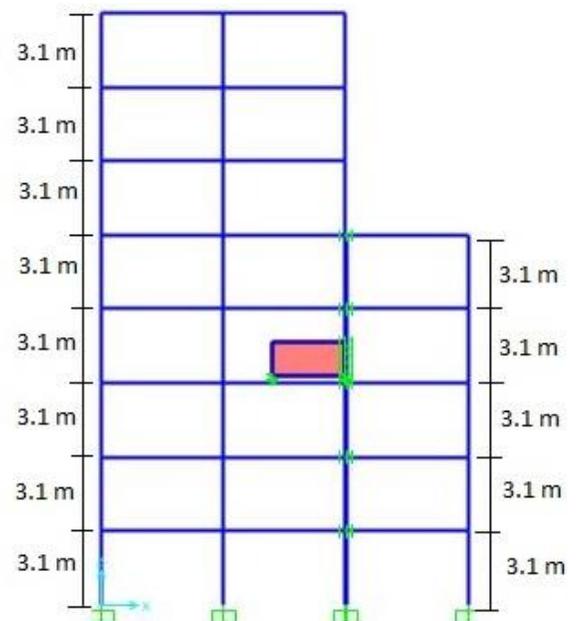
Elevation view of adjacent buildings while NSE is incorporated at 3<sup>rd</sup> level of building A.
